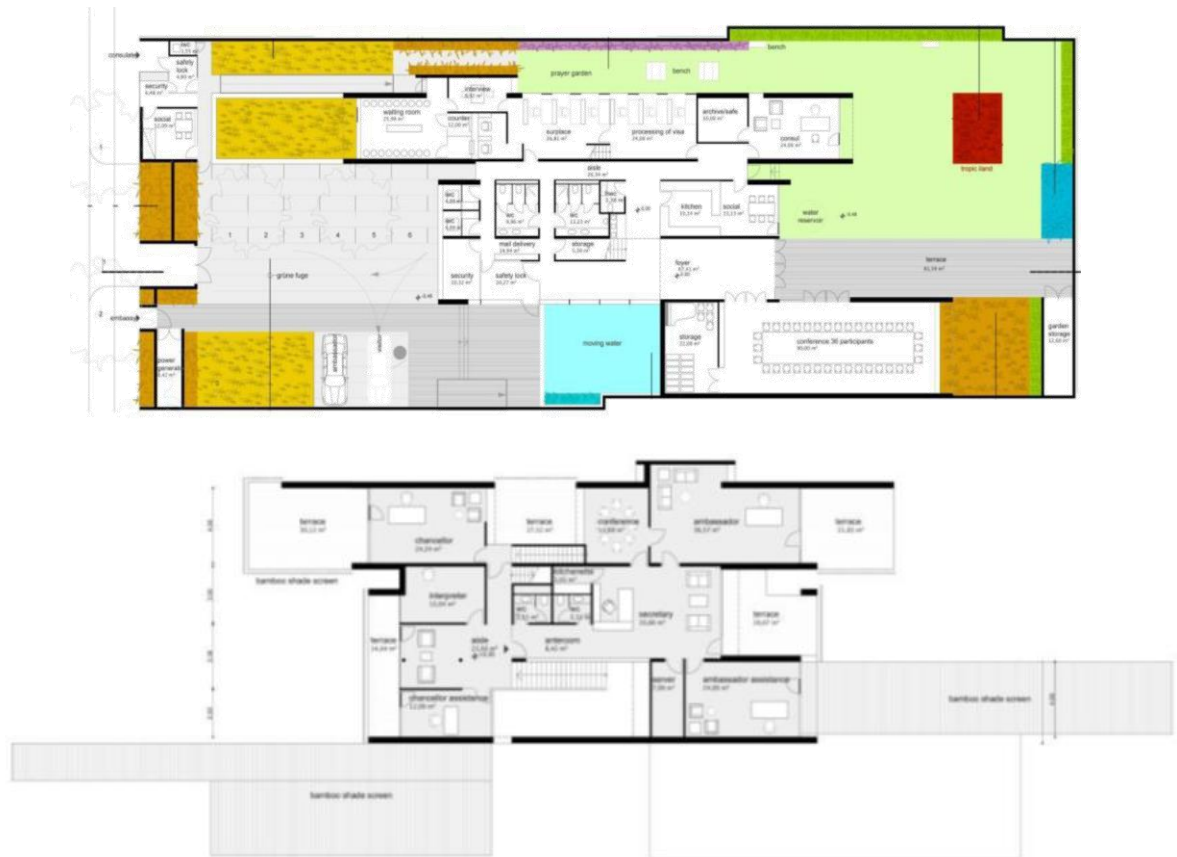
Jakarta embassy ground and first floor layout (Oettl, 2014)
